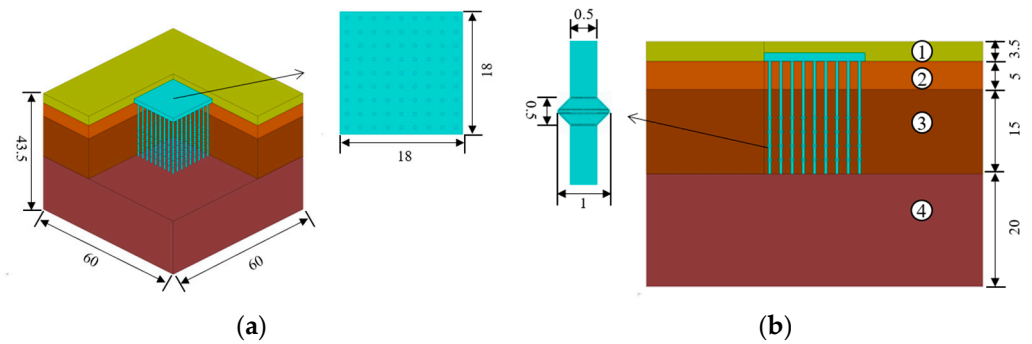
Schematic diagram of squeezed-branch pile group foundation (unit: m). (a) Three-dimensional view of the pile group foundation. (b) Basal section view of the pile group foundation.
